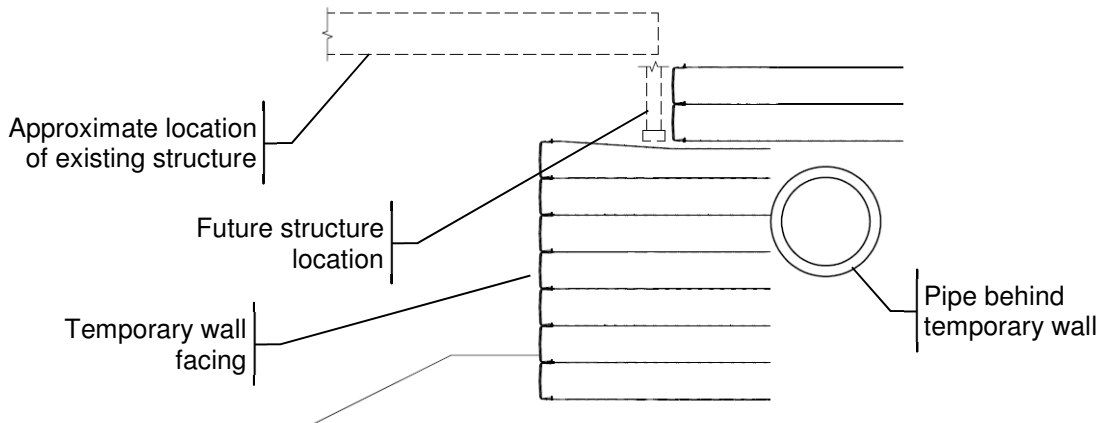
Tiered Wire Mesh Facing MSE wall used for staging.
